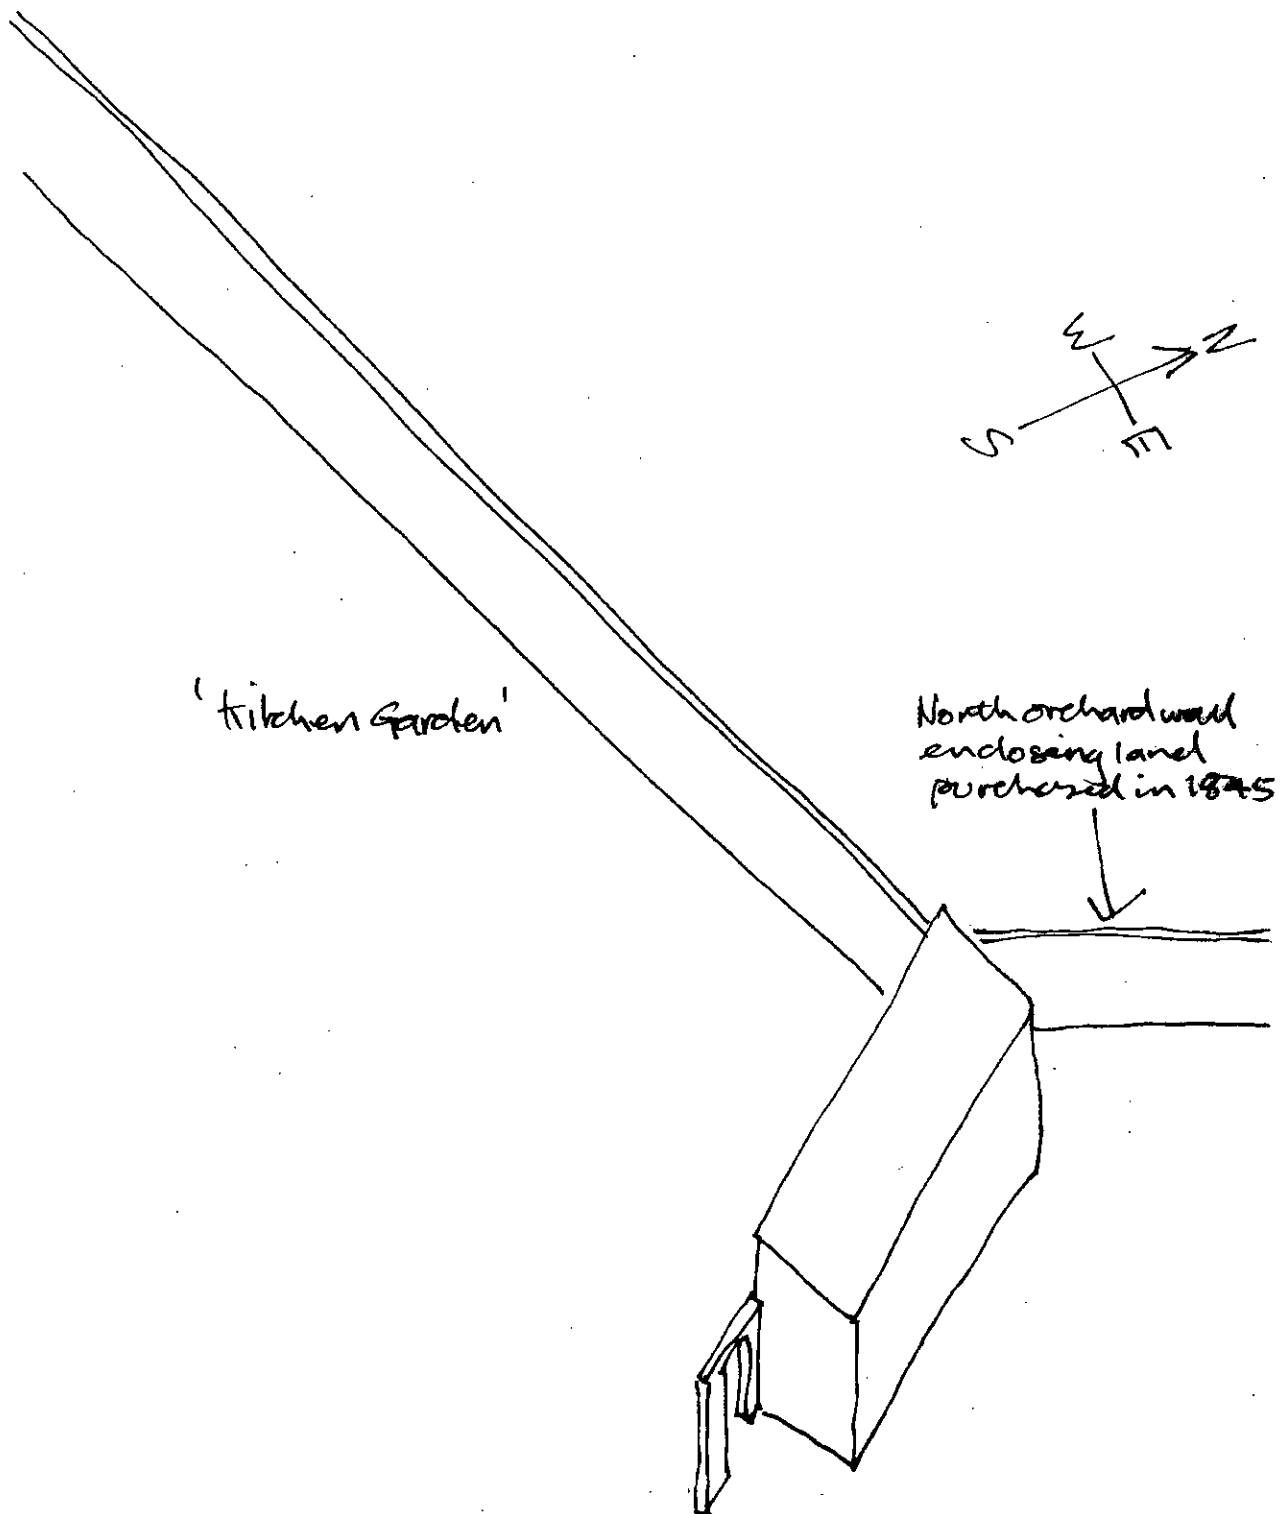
Simplified plan of the garden wall and greenhouse built in 1856
